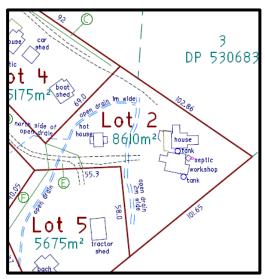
Overall scheme plan depicting location of above mentioned drain.
